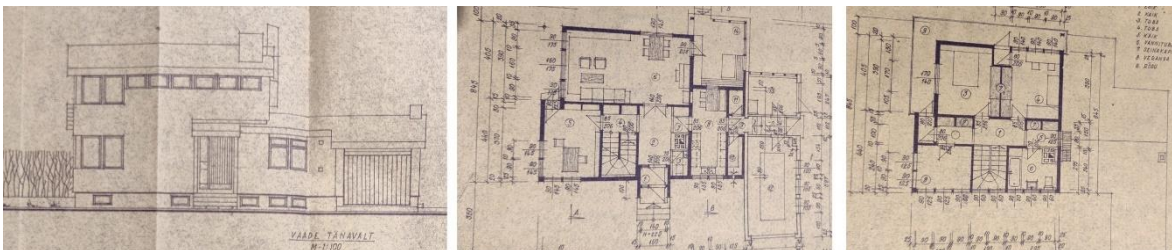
Kalda 1-a (1972) in Väike-Maarja (left to right: elevation, ground floor layout and upper floor layout)
